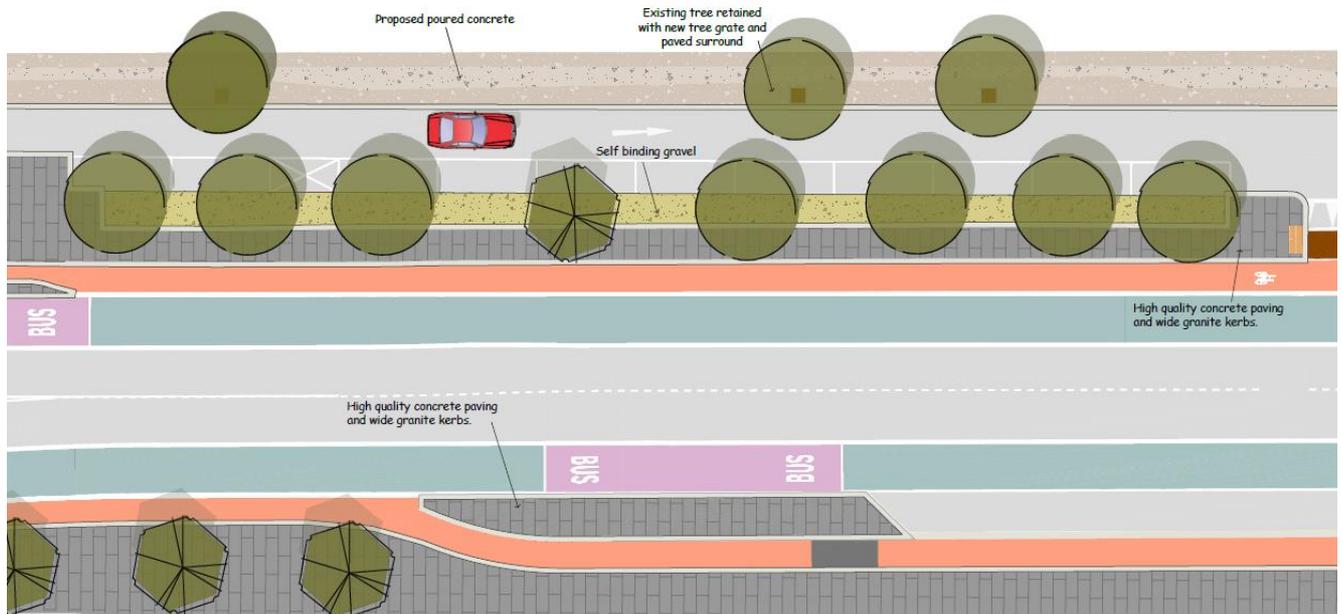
House No. 370 to No. 352 Ballyfermot Road
